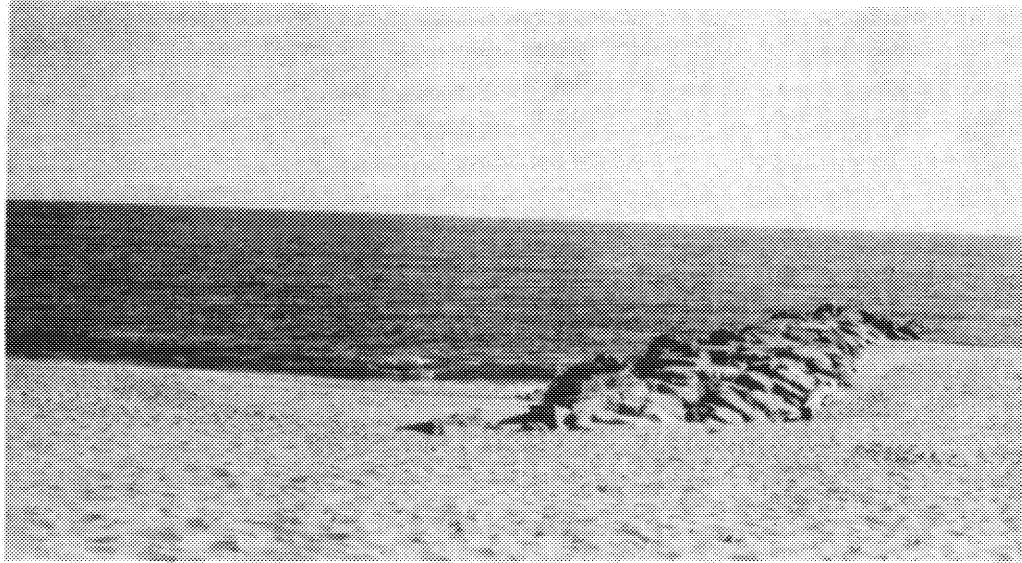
12 Sept. 1966. Turnpike Groin. Note erosion on north side.
